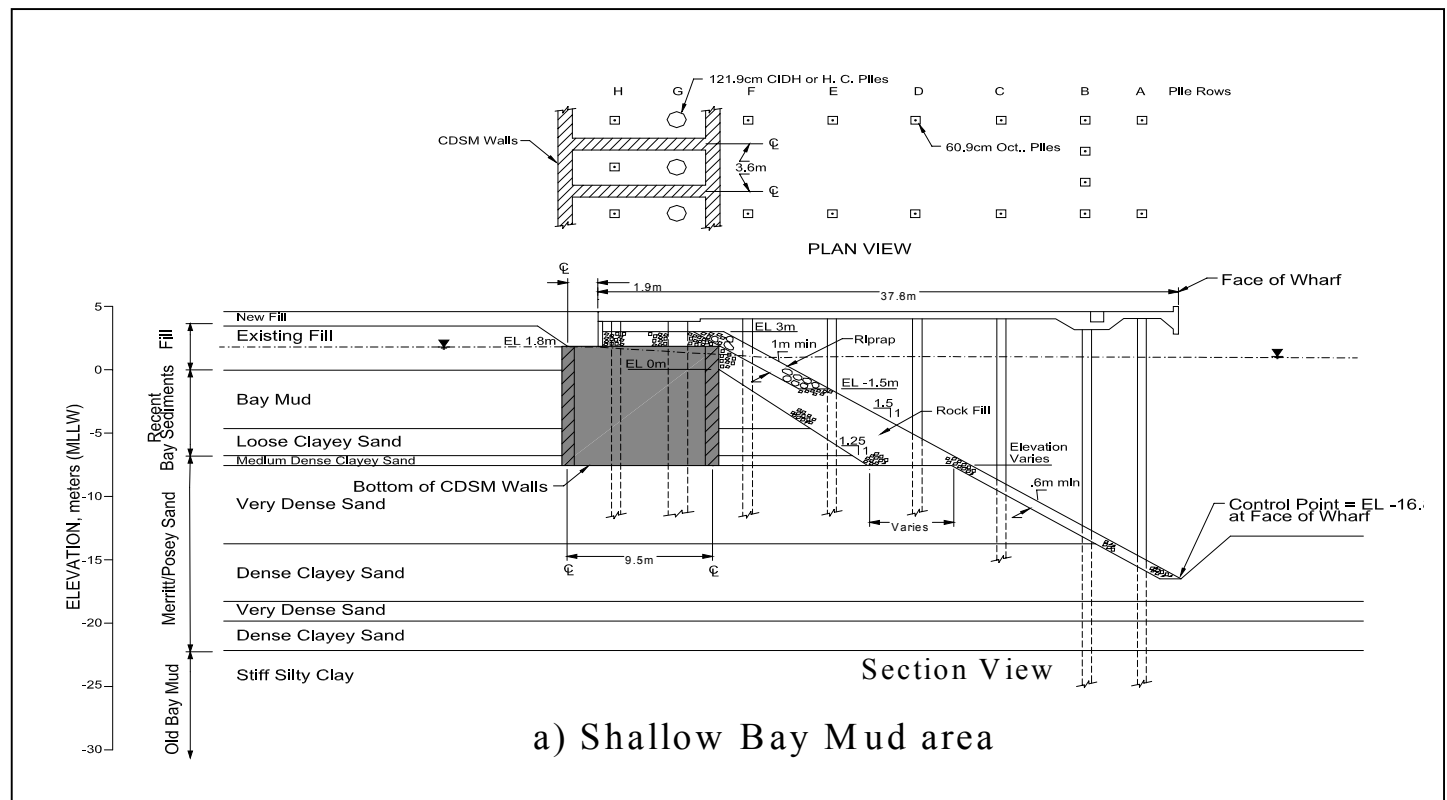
Cross Section of CDSM, Shallow Bay Mud Area, Berths 57/58, Port of Oakland
